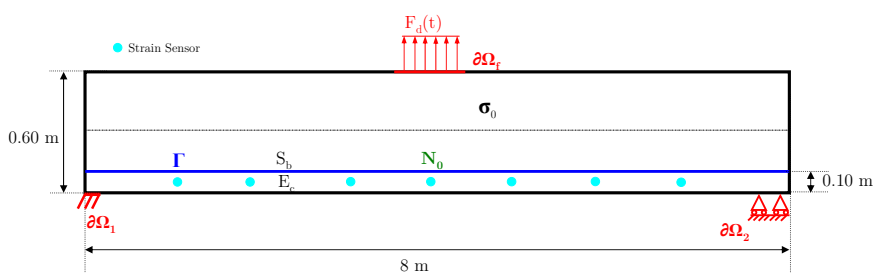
Concrete beam with a horizontal steel bar - Beam instrumented with 7 strains sensors.
